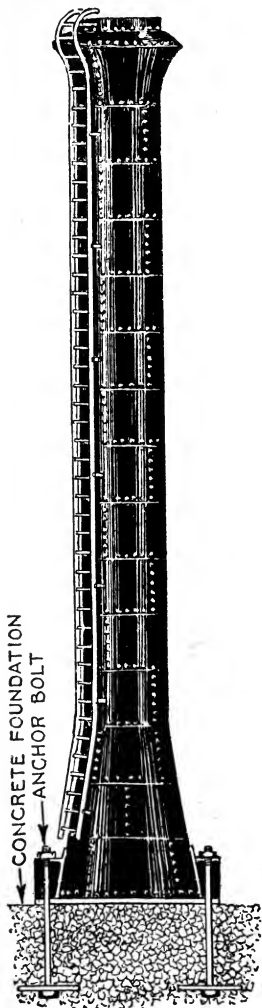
,620.—Typical self-supporting steel stack, showing foundation and anchor bolts.
